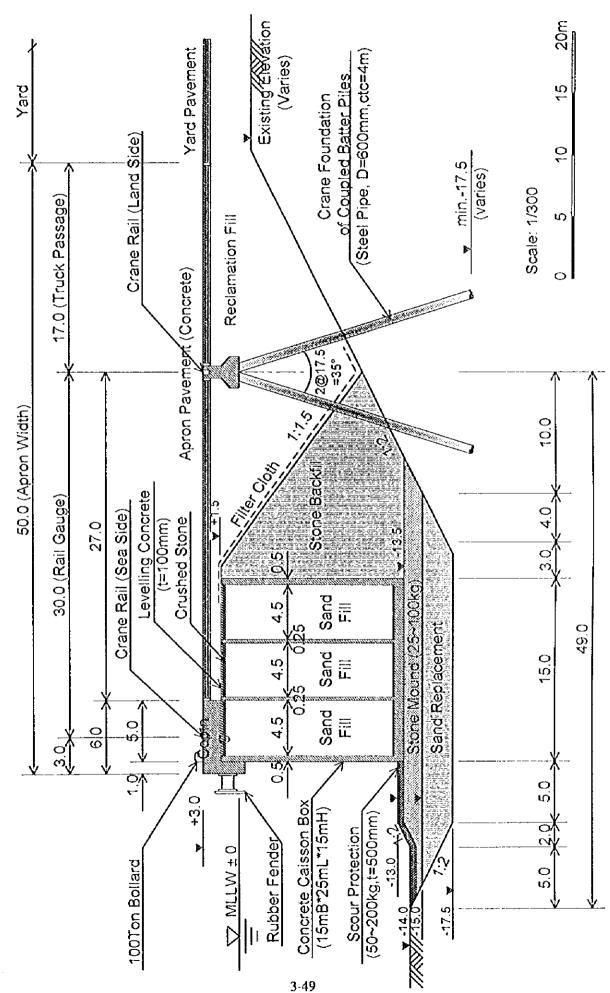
Typical Section of the Caisson Quay Wall for the New Container Terminal at Cubi Pt.
